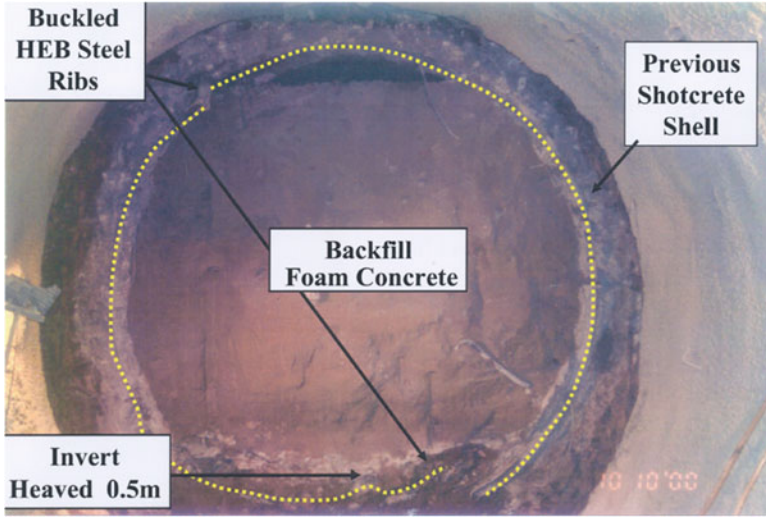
Cross section of the bench pilot Bolu tunnel with marked locations of the maximum damage to the shotcrete lining (Kontoe 2009)
